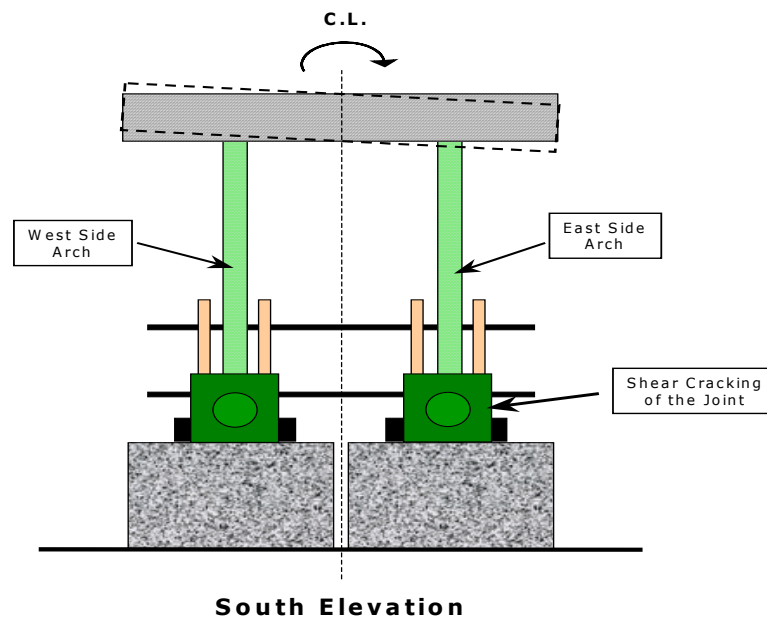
Wrap Shear Cracking at the North End Joint, East Arch.
